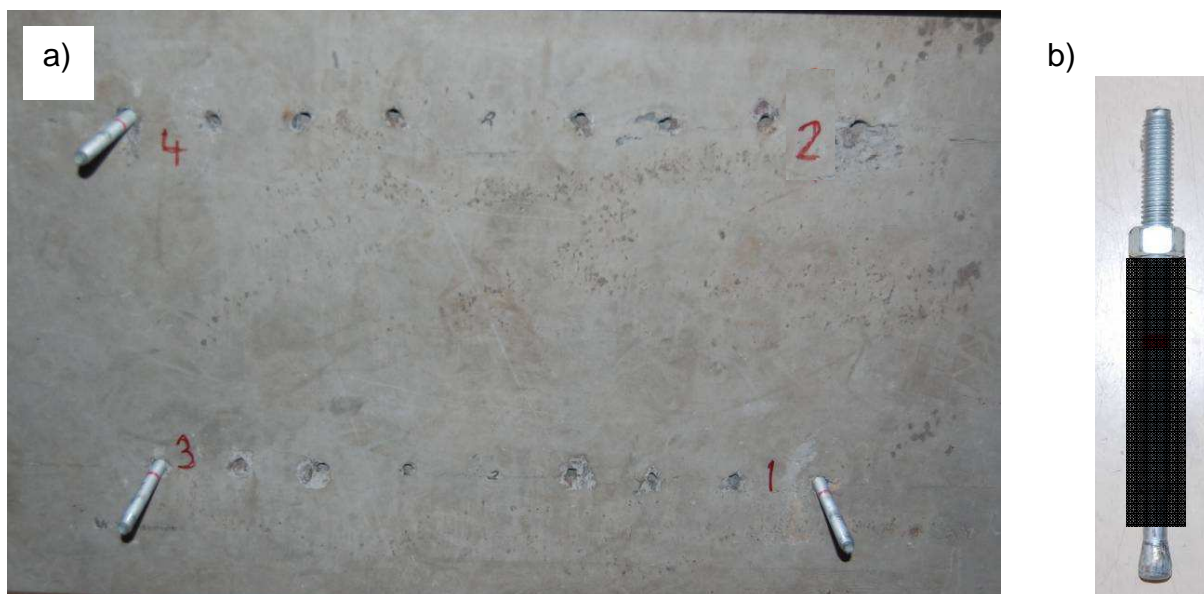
a) Failure photograph of the 60 % test run on the EAb1 anchor
